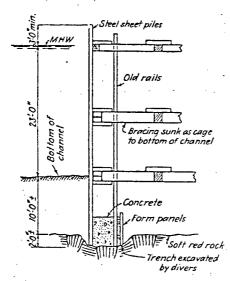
Cofferdam with concrete seal used for Ferry St. Bridge piers over Quinnipiac River by C. W. Blakeslee and Sons, New Haven, Conn. QUE'B'. Thus
